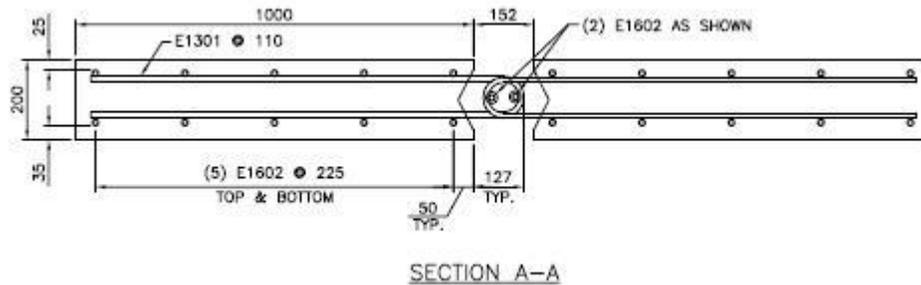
Prototype Panel (Pairs) for Testing Joint Fill Performance⁷
